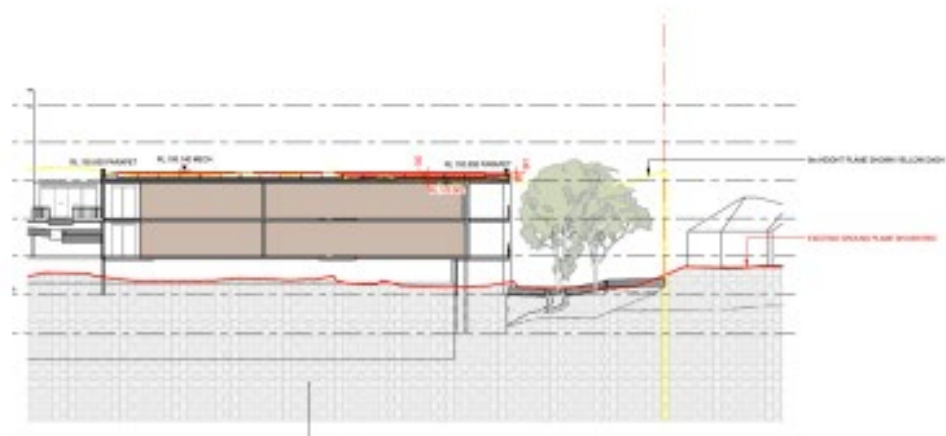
Cross section 3 – Building A (Cox drawing DA-99-05)
